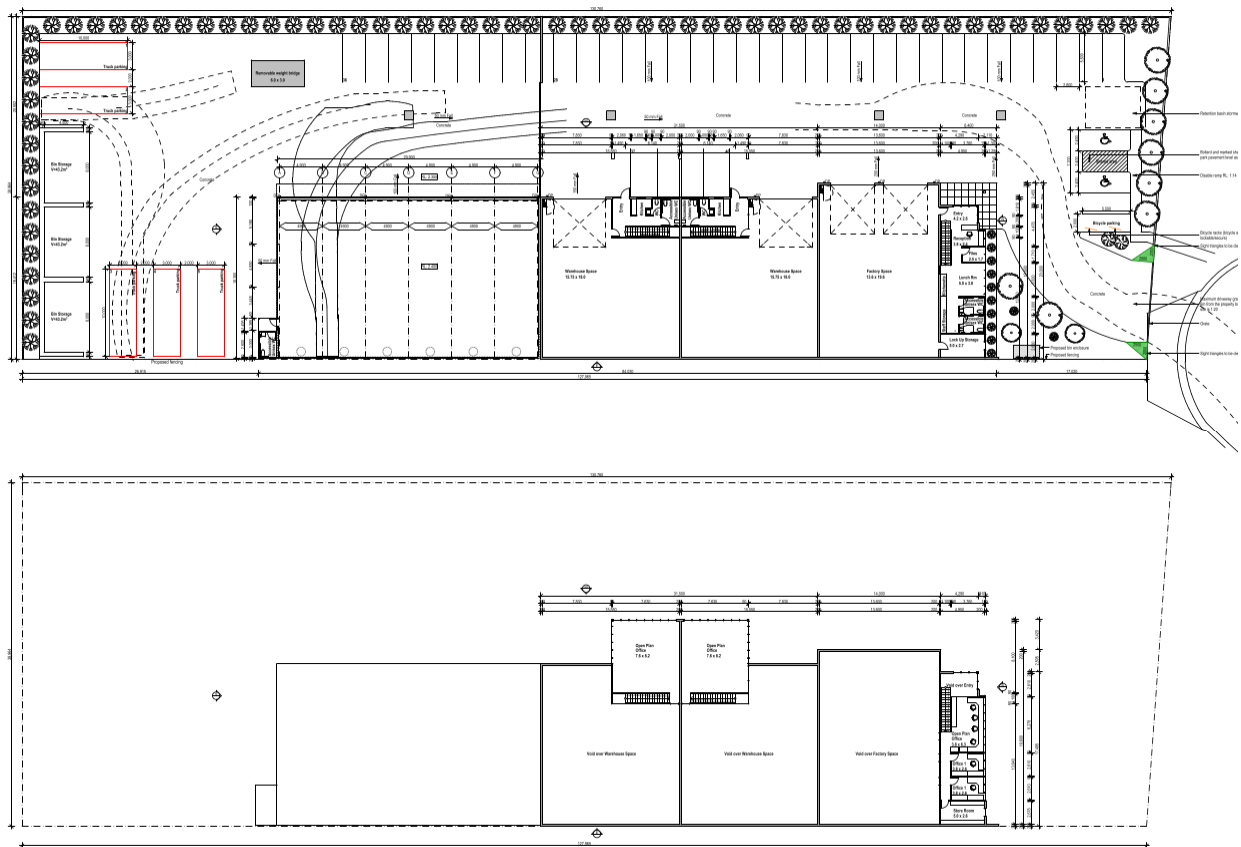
Originally Proposed Ground & First Level Layout of Development Site
